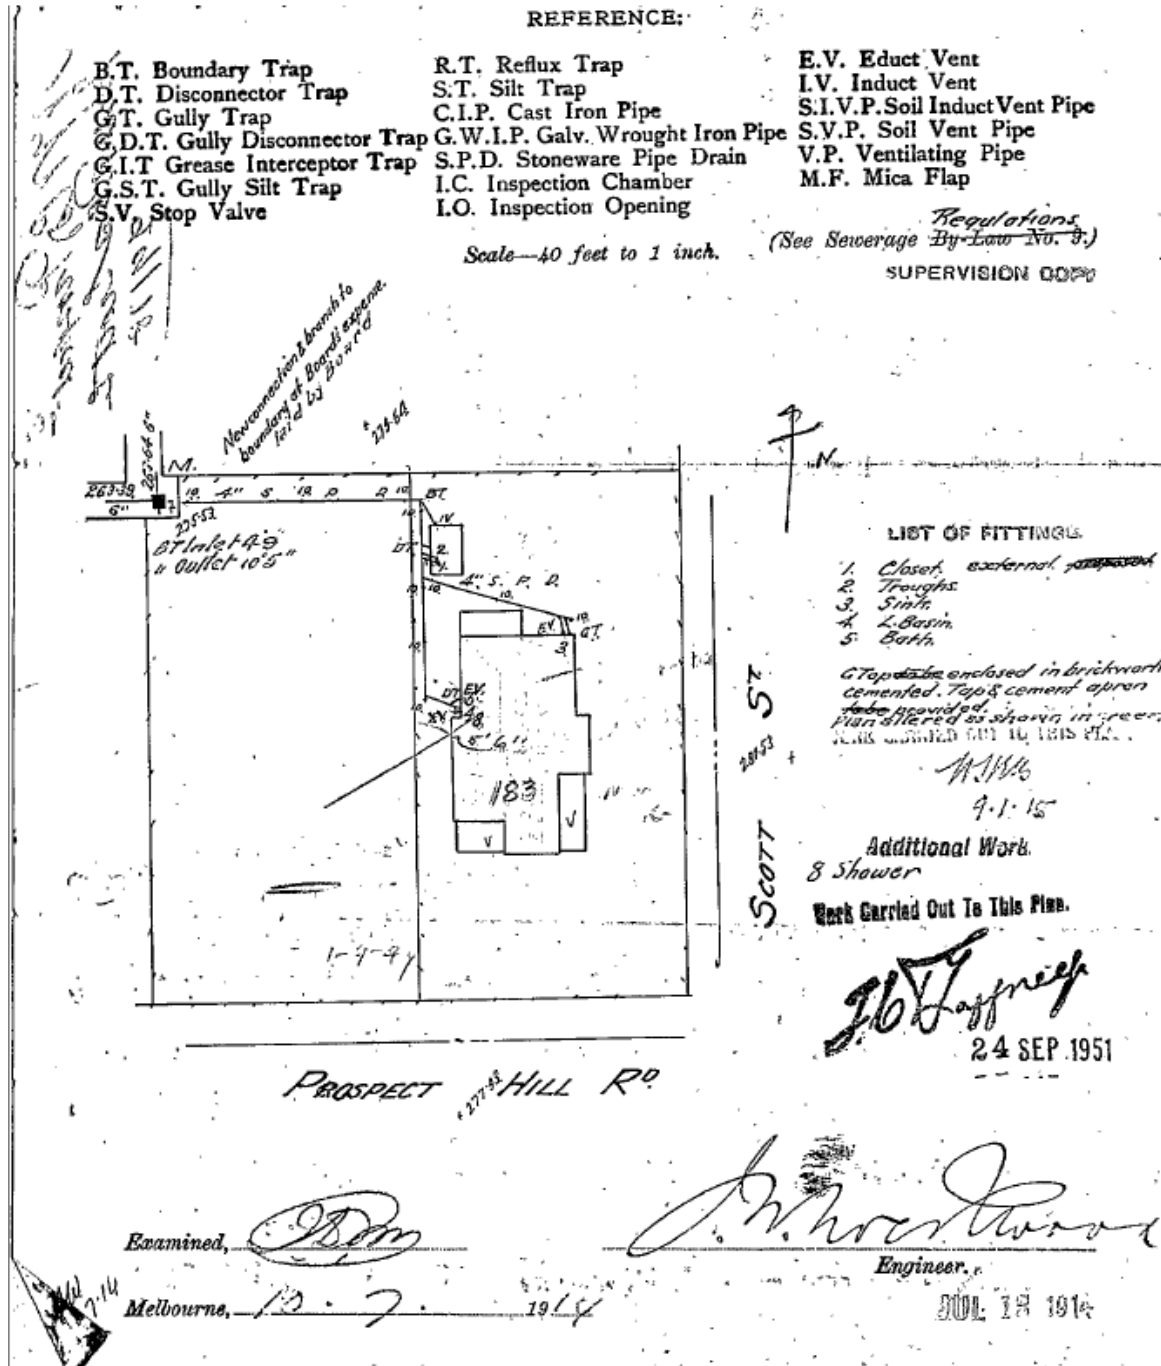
Property Service Plan, 183 Prospect Hill Road, Canterbury.
